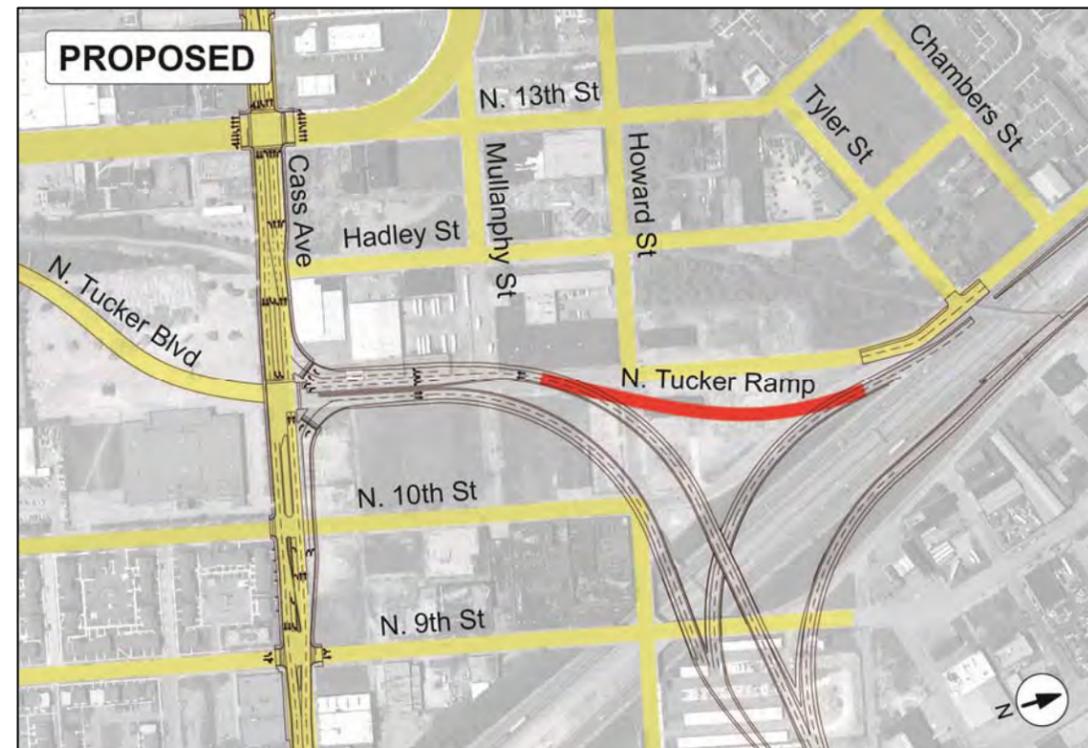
Proposed Layout of North Tucker Blvd off-ramp from I-70
